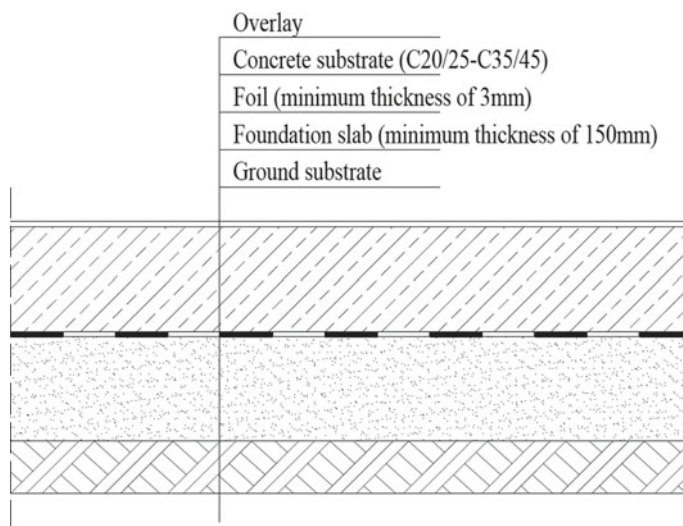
Cross-section through a typical industrial floor applied on the ground
